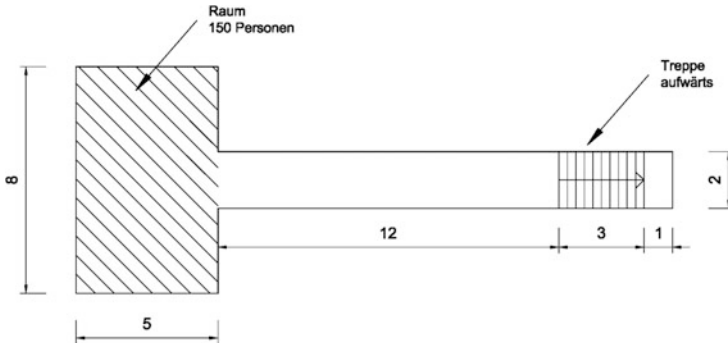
Floor plan for test case 13. Measurements are in m [5]
